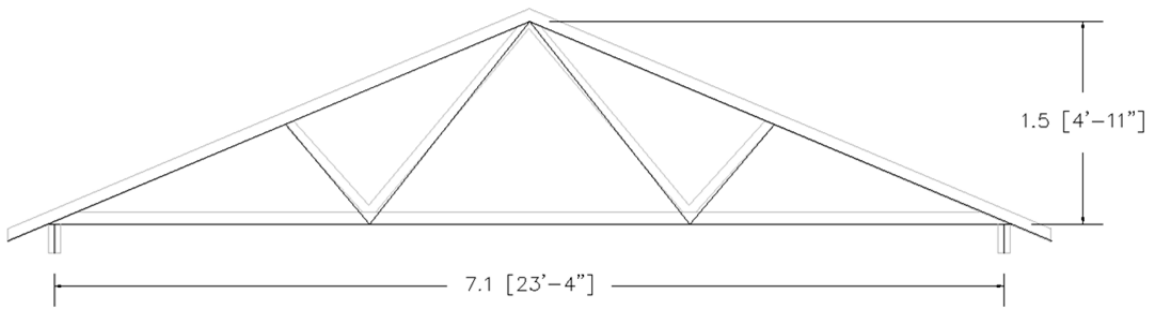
Assumed Framing with SAP2000 Wire Frame Overlay for Type A Trusses – m (ft-in)
